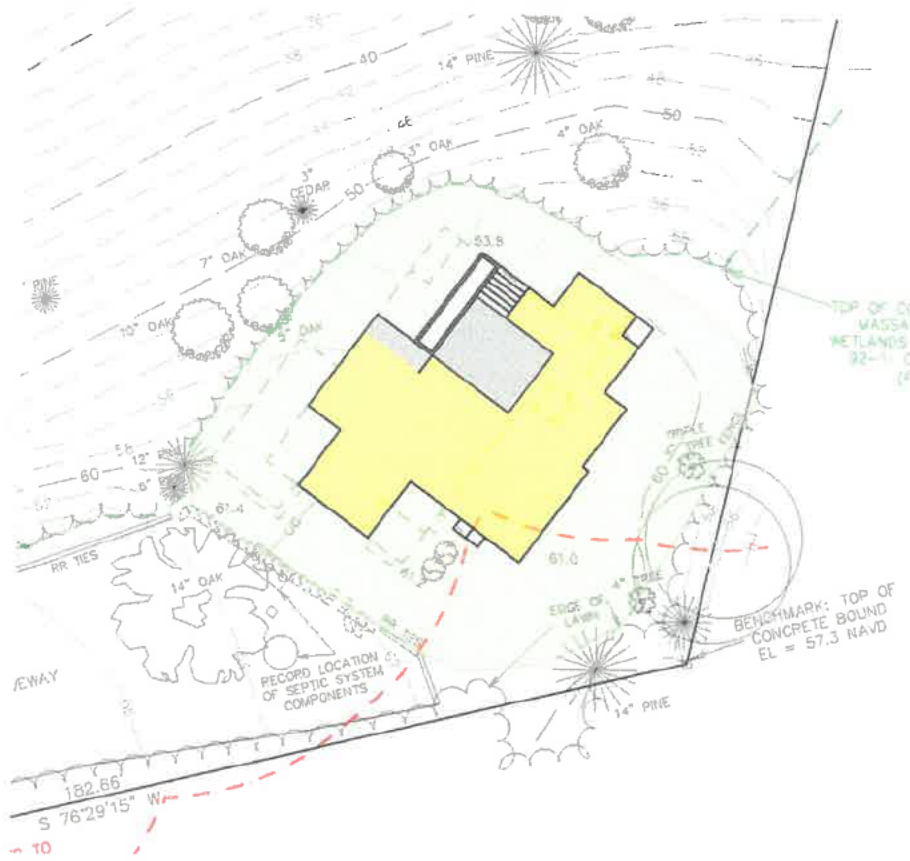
Alternative 1 - Reconstruct a new single-story home on the existing foundation
